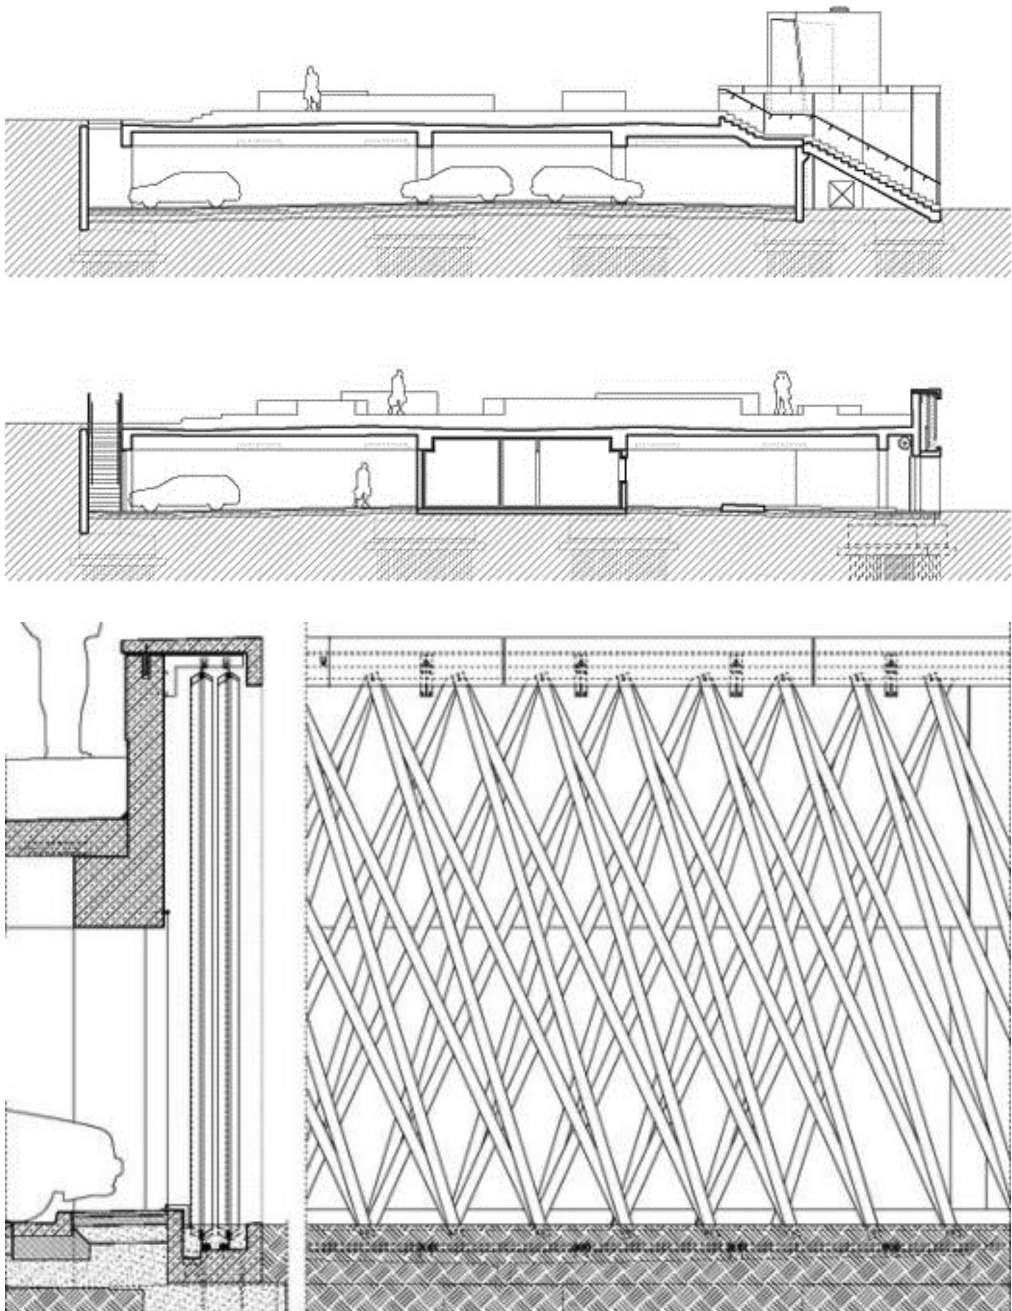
, 18. Flood-resistant garage – construction sections (source: [22])
